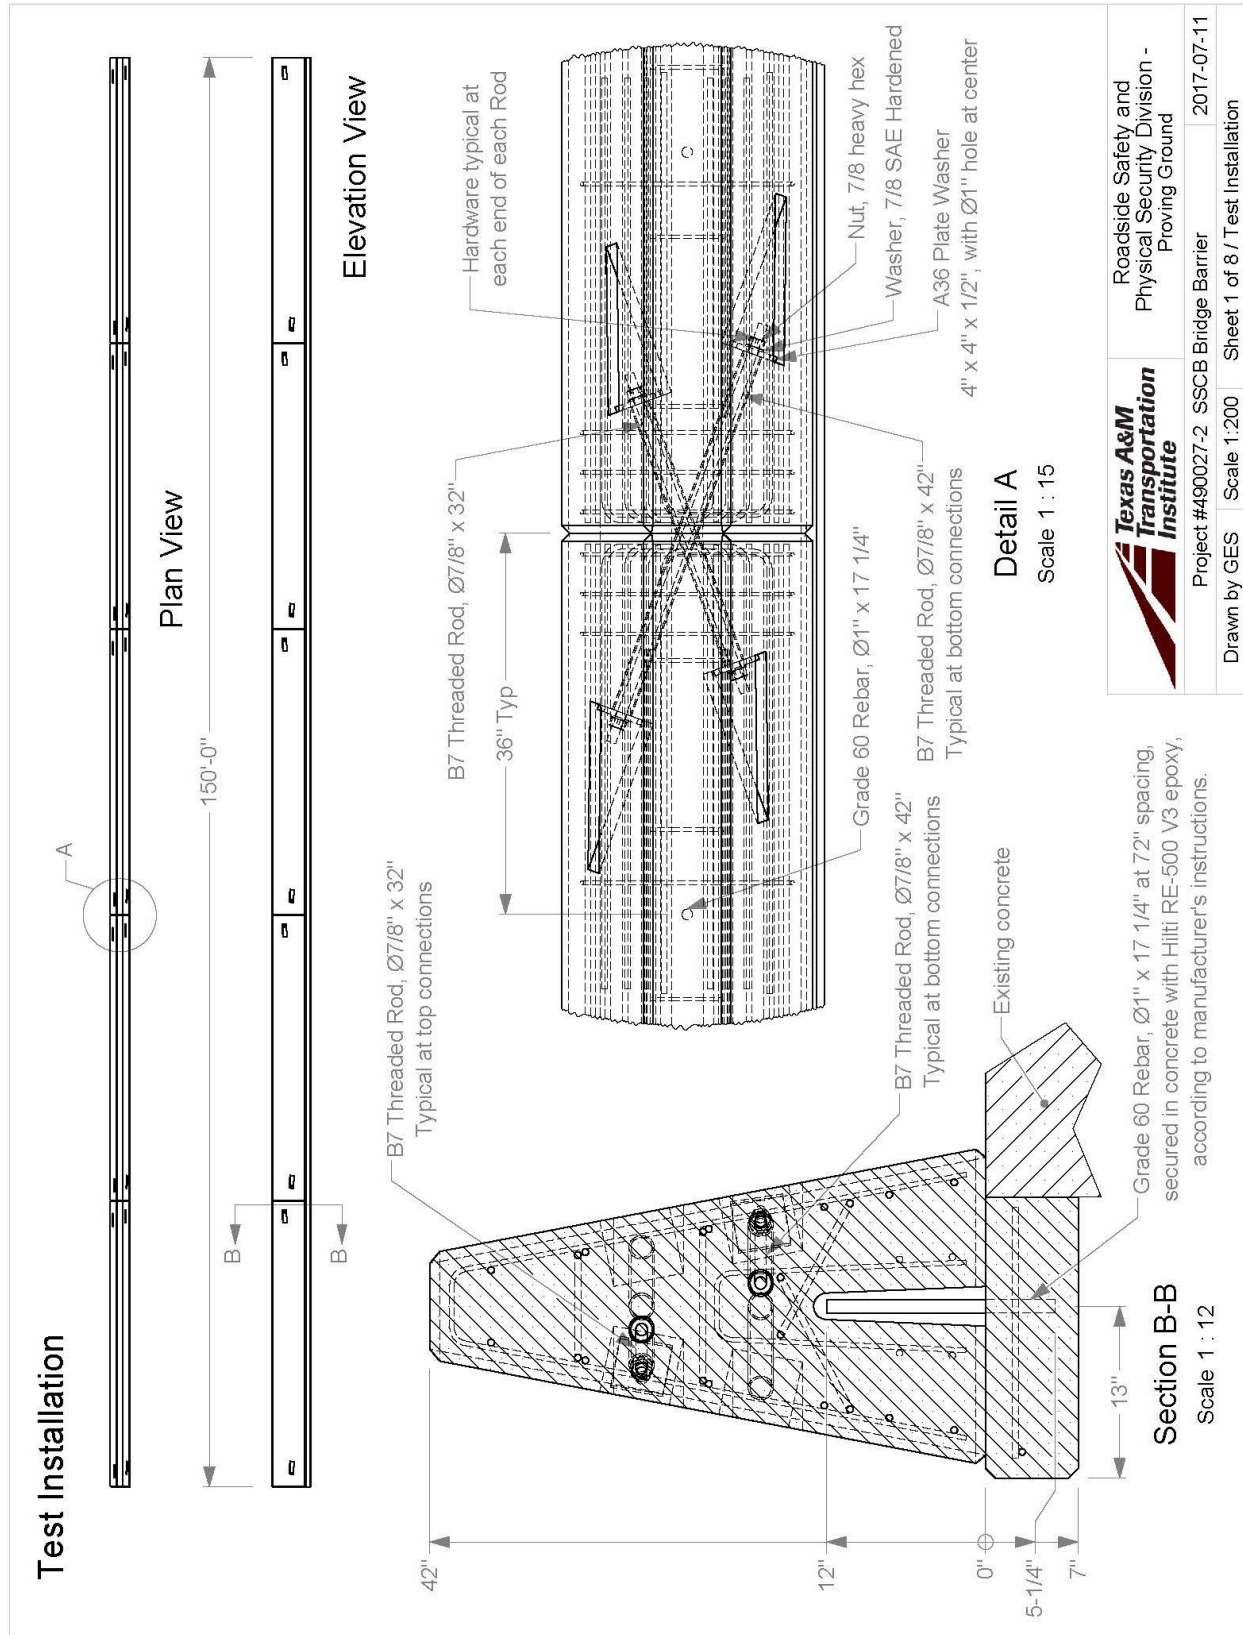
Overall Details of the Restrained Safety-Shape Concrete Barrier on Concrete Bridge Deck.
